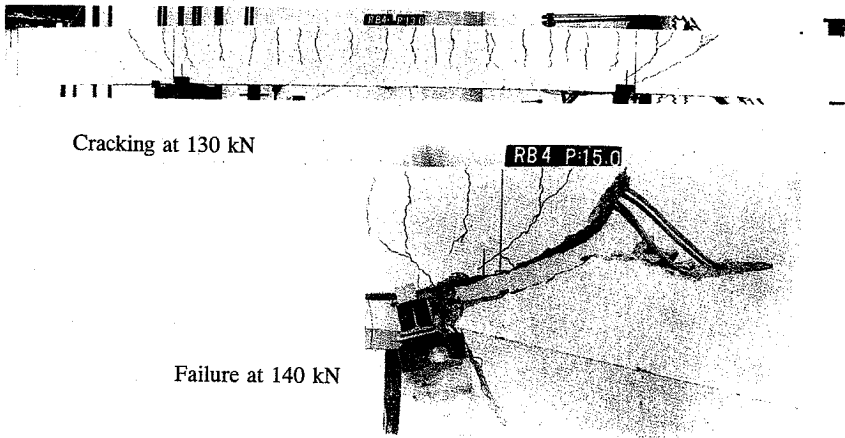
Crack pattern of a prestressed beam at failure [77,1]
